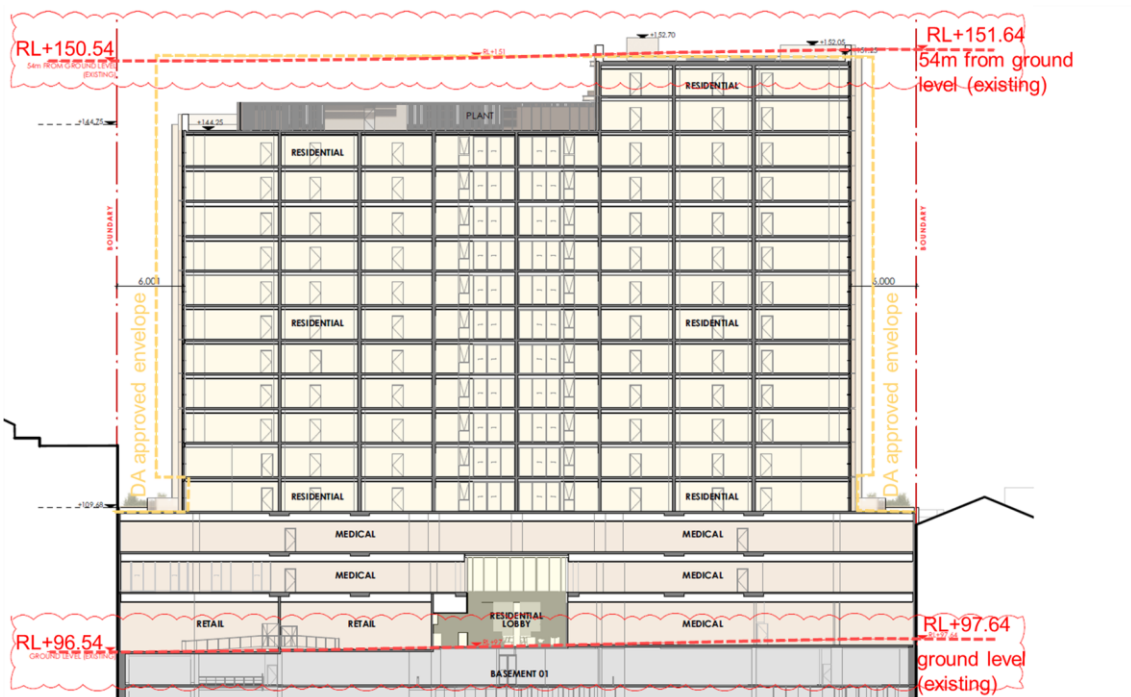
North/south section plan (Source: Fitzpatrick Partners)
